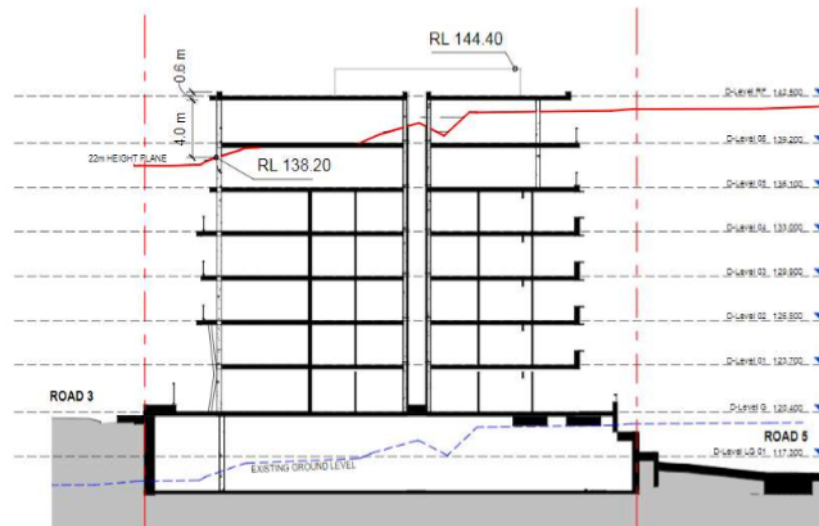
South Section of Building D showing the extent of height contravention (4.6m) (Source: Mirvac Design)
